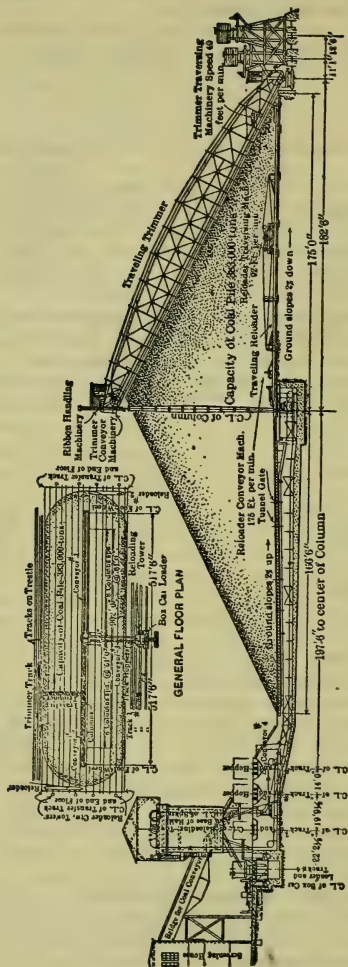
Ransom plant, Lehigh Valley Coal Co. Plan and cross section.
